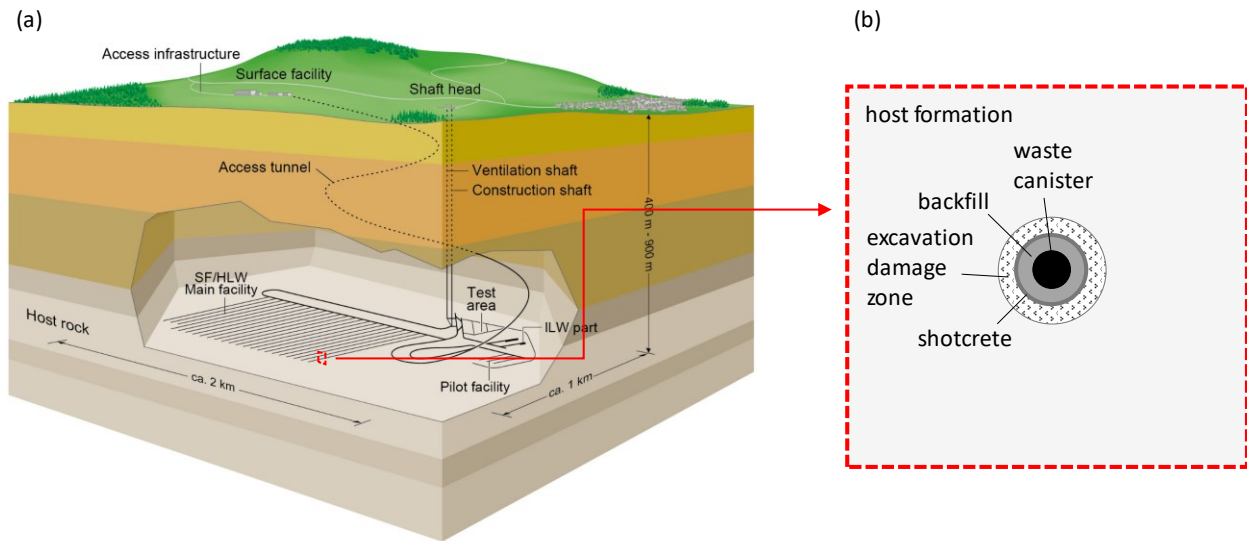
(a) Example layout of the high-level waste repository with necessary features (Poller et al. 2014) and (b) cross-section of the waste emplacement layout in an excavated host rock. Drawings on not on the scale.
